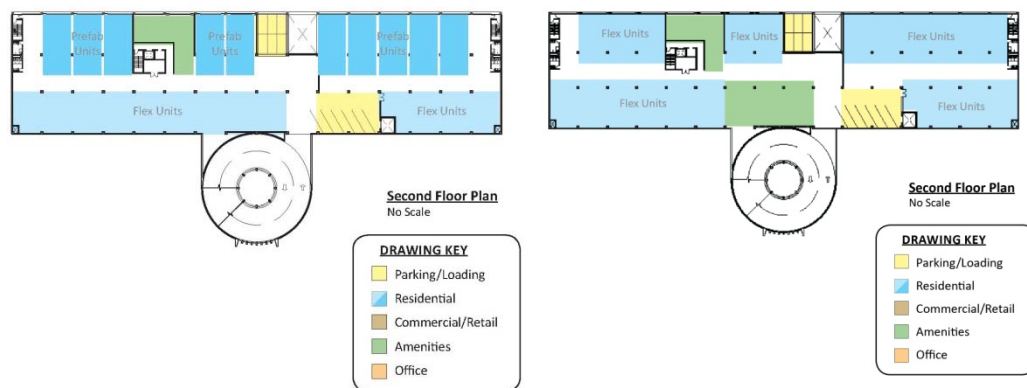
Sketch of Prefabricated Residential Unit Sections²⁵³
